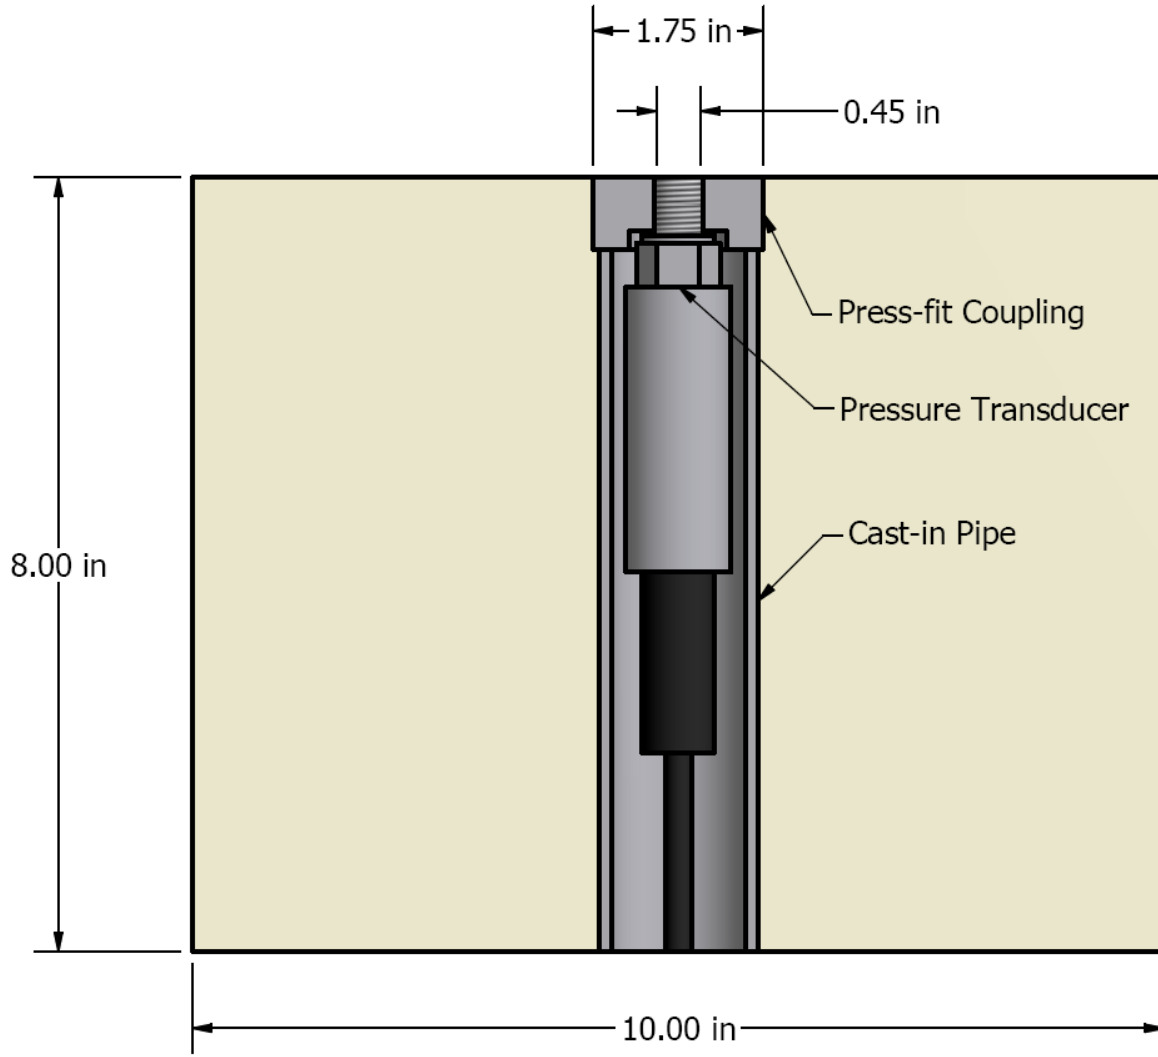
Profile View of a Cross-Section of a Concrete Specimen Instrumented with a Pressure Transducer
